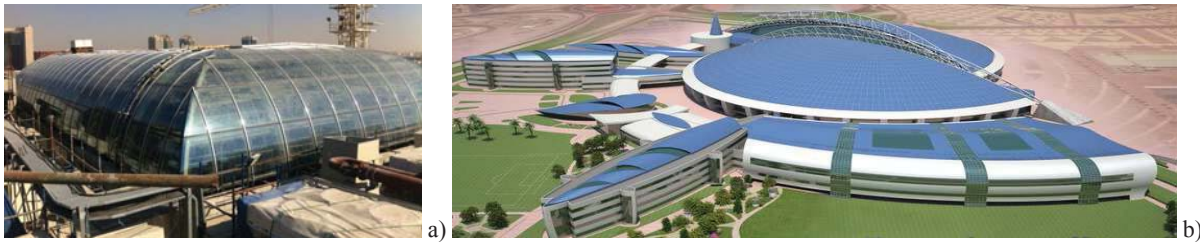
Curtain wall of the Le boulevard skylight (a) and Aspire Academy exterior work (b)
